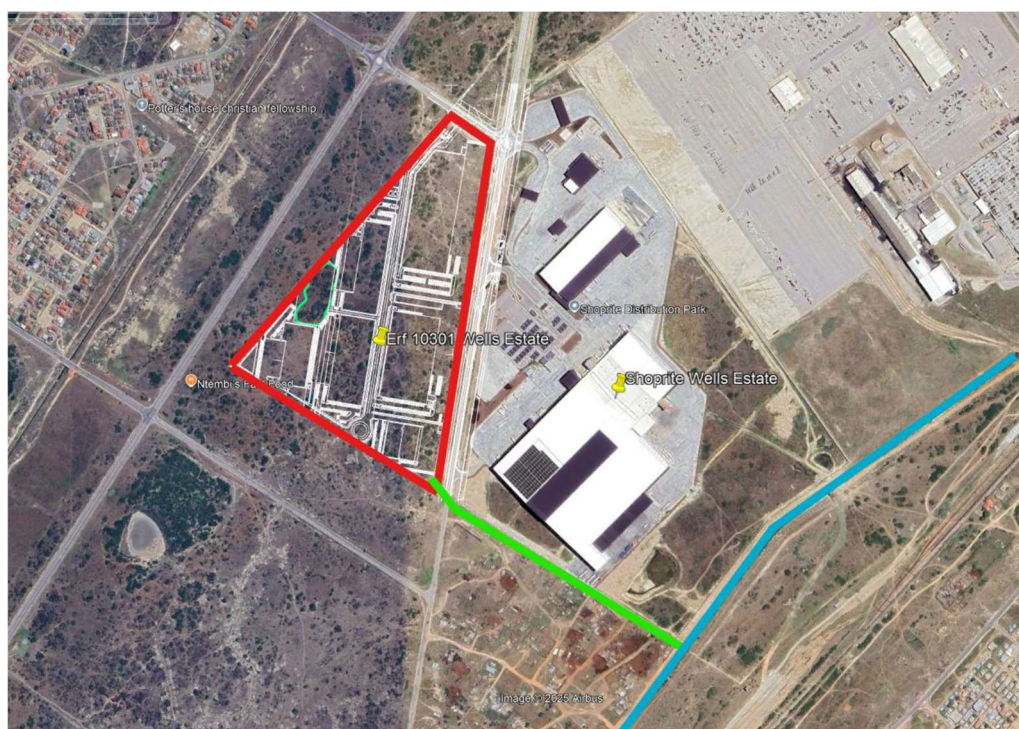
Proposed Stormwater connection in green (red = site; blue = existing SW channel).
